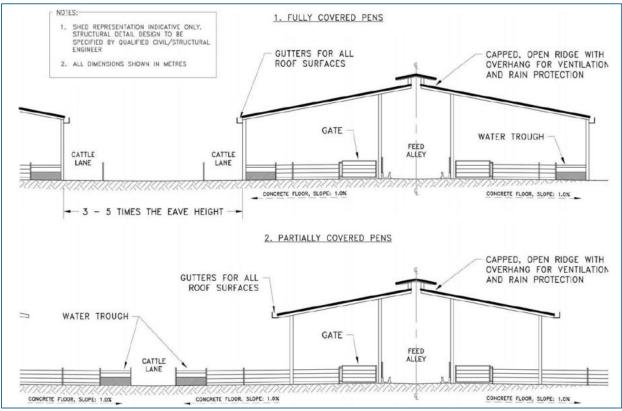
The technical design of a typical feedlot shed and elevations proposed to be constructed at Keetmanshoop and Aus Settlement (Source: LiveCorp, 2020)
